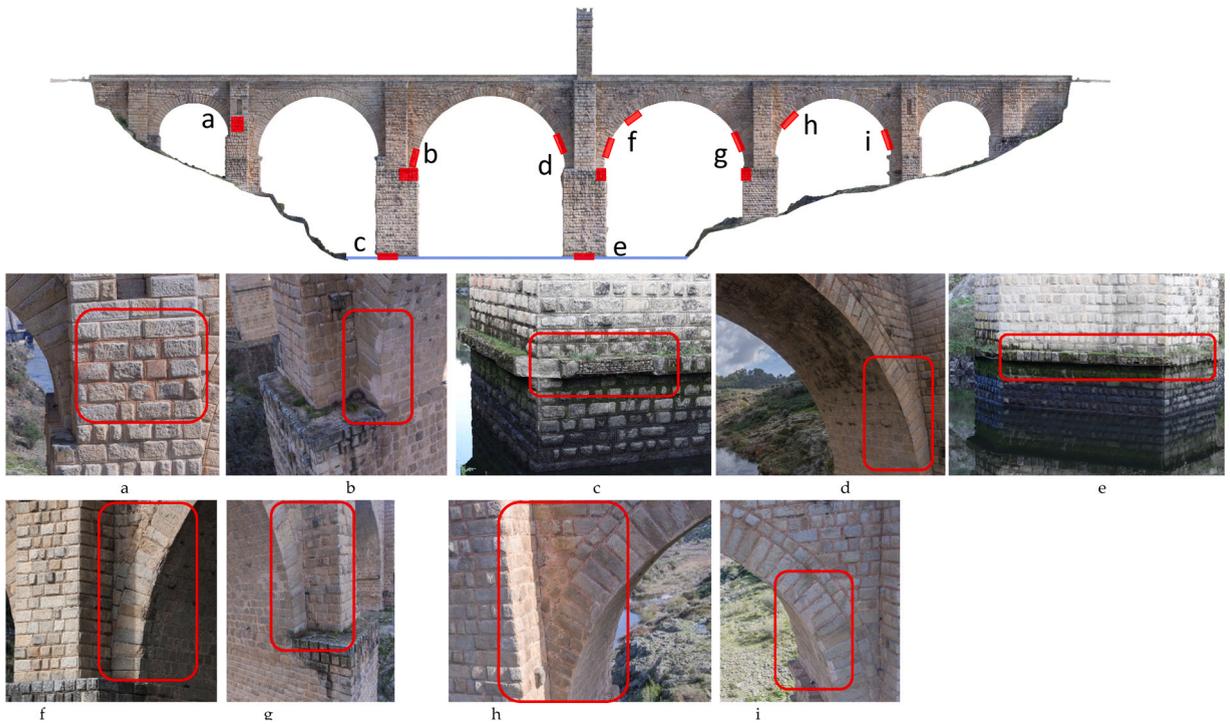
The upper figure shows the downstream elevation highlighting some of the areas with concrete and reinforced concrete interventions. The lower figures a) to i) show detailed images of these interventions.
